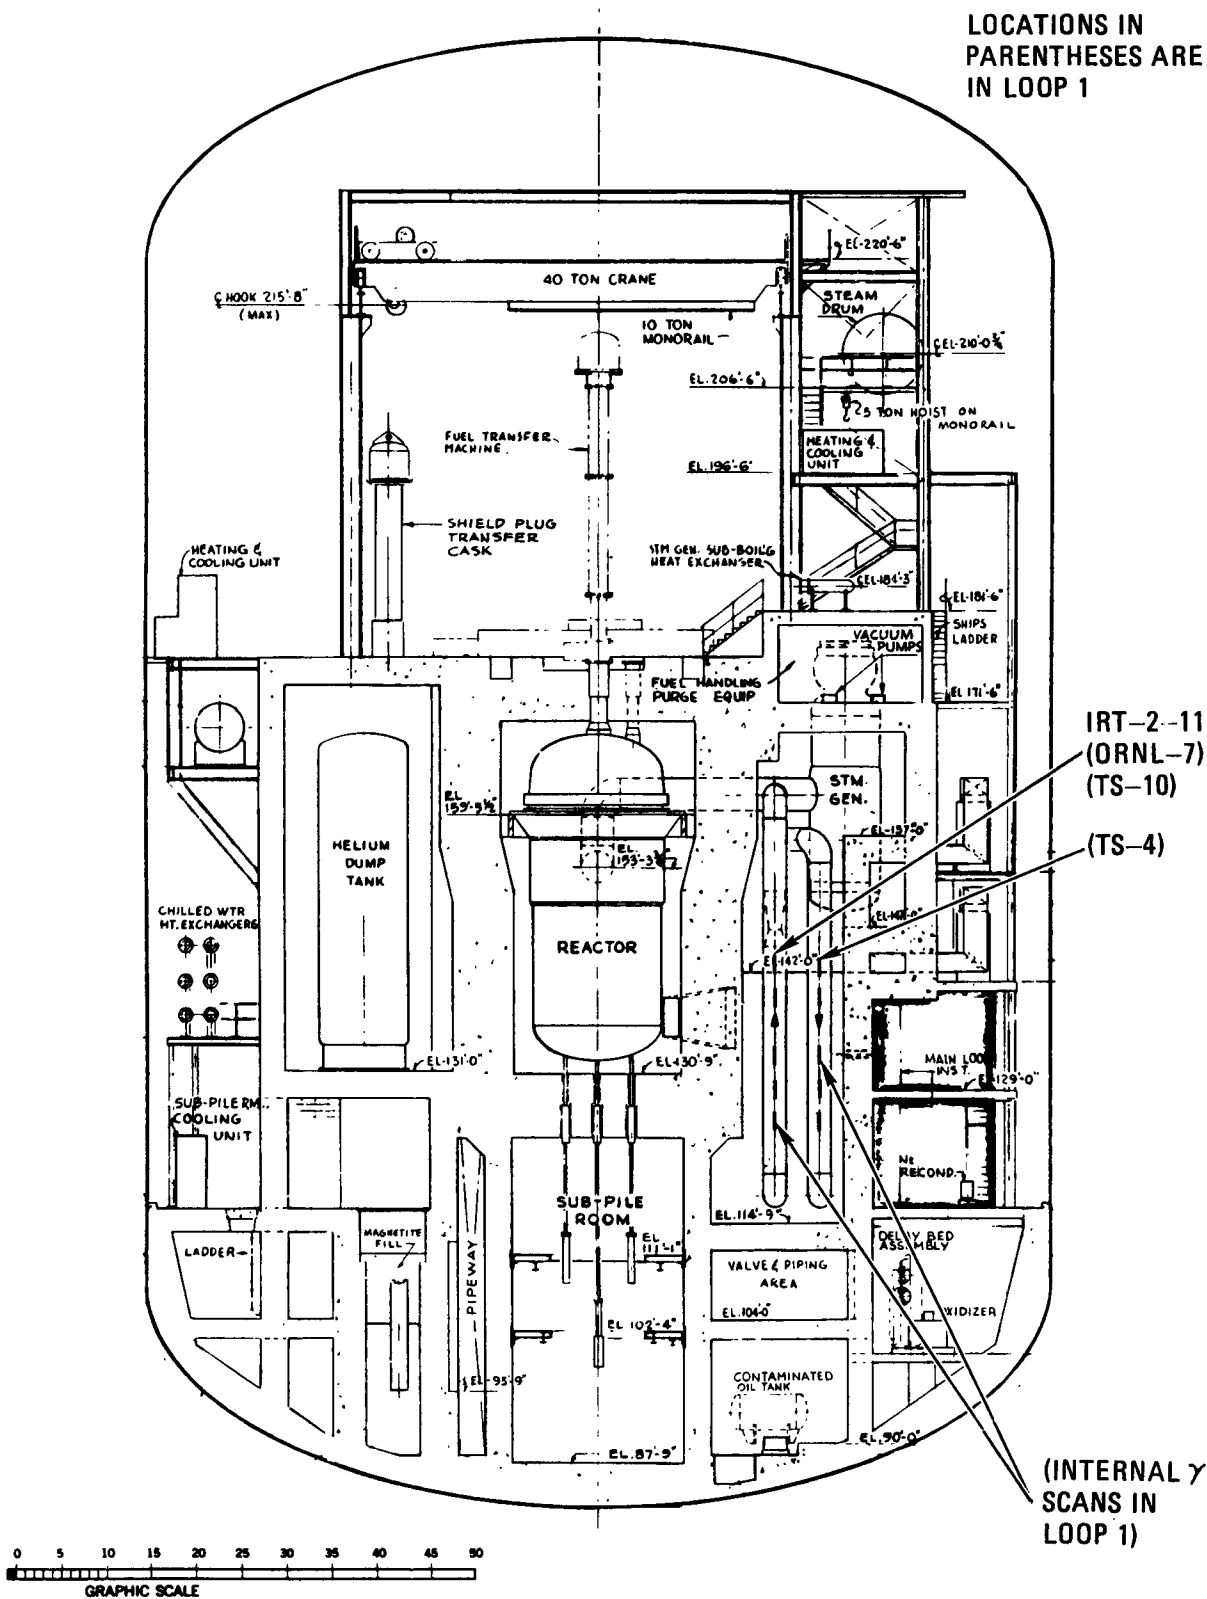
Elevation view E-E showing positions 4 and 10 (both 4 and 10 are at elevation 144 ft 0 in.)
